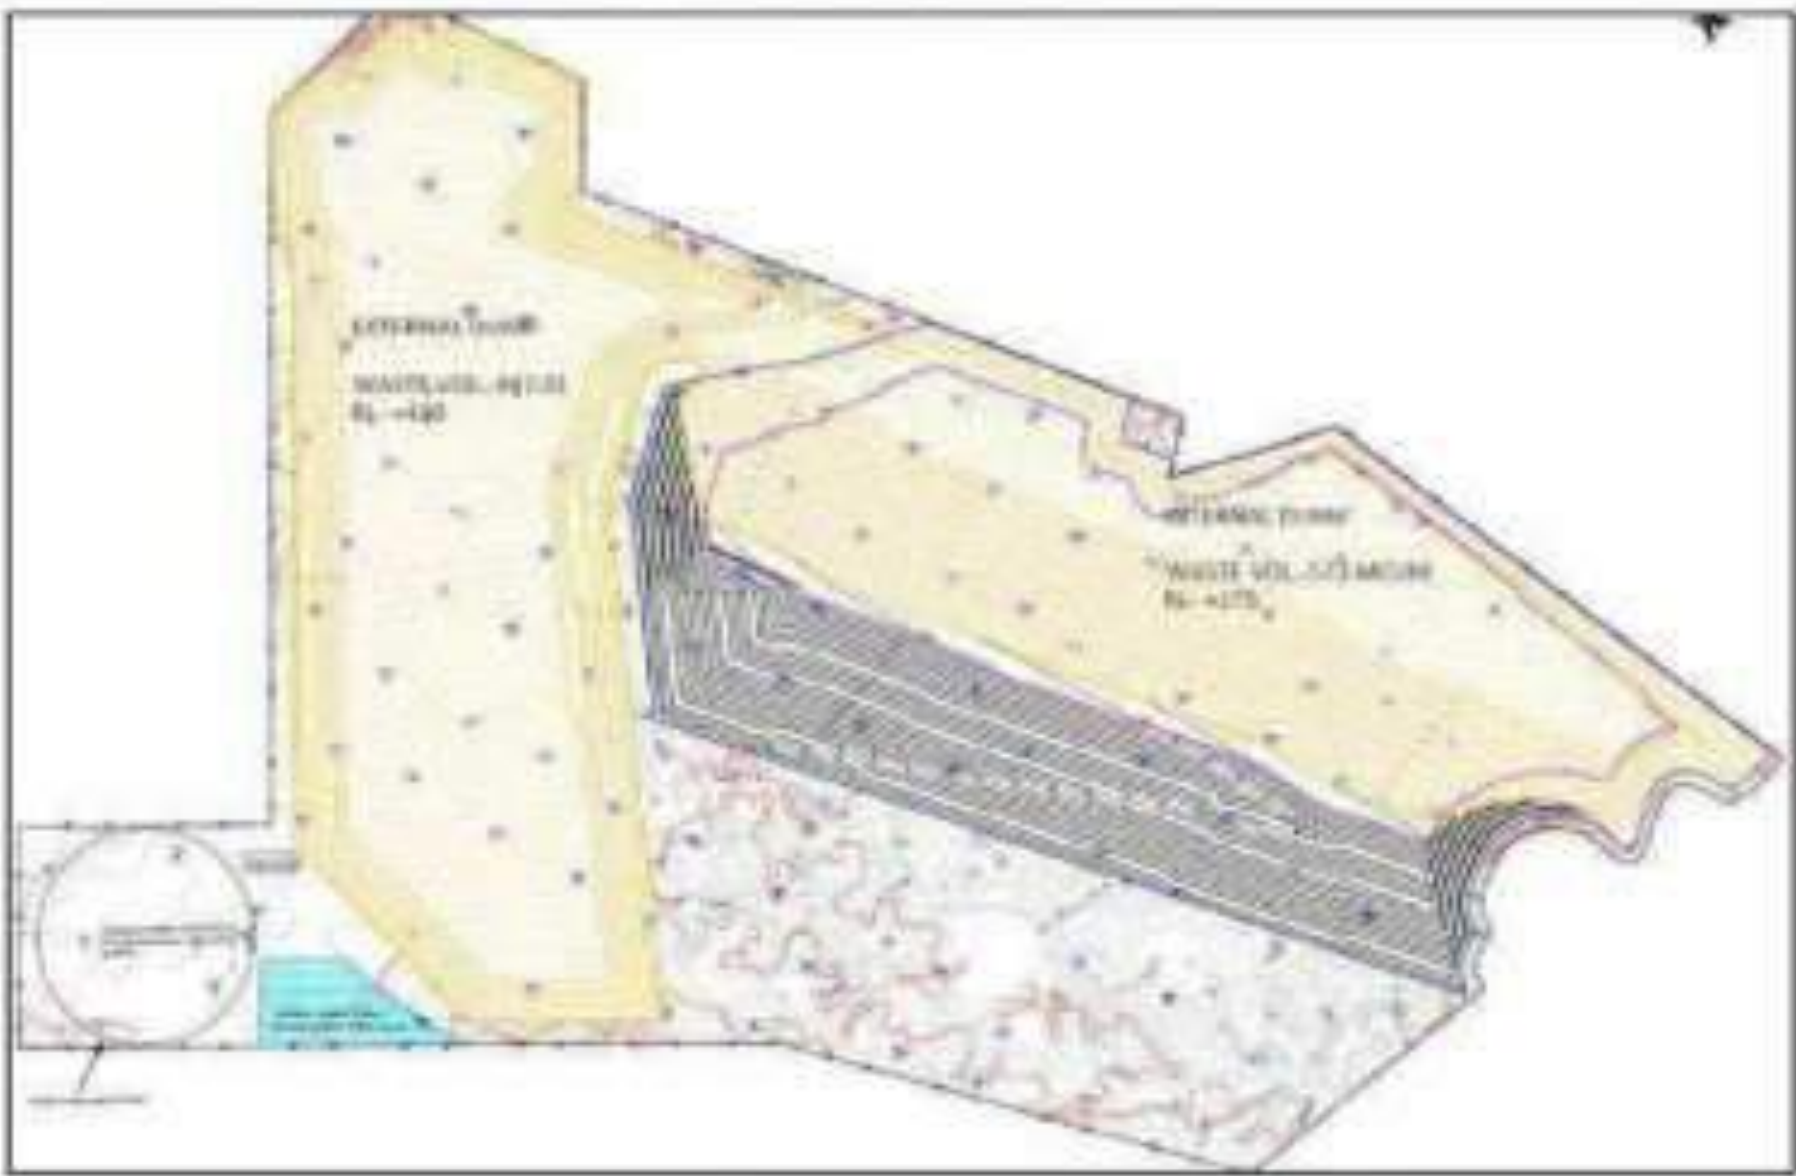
20<sup>th</sup> year modified mixing plan of CMPDIL.
